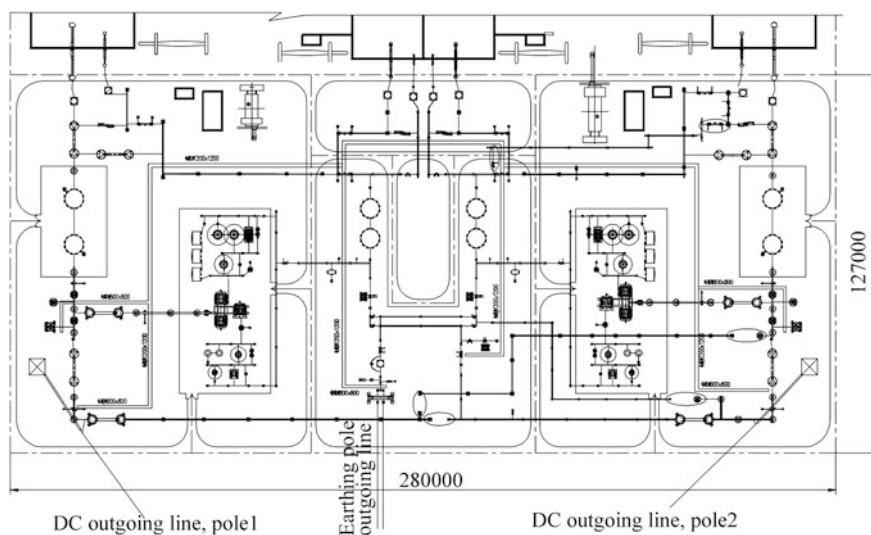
Typical outdoor UHVDC switchyard (mm)
